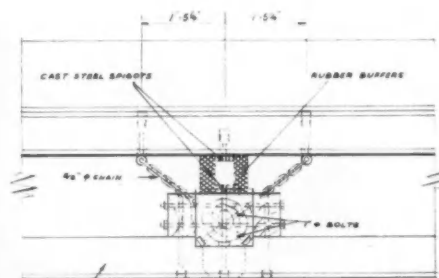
Sectional plan showing arrangement of rubber buffers at Bluff Harbour.
